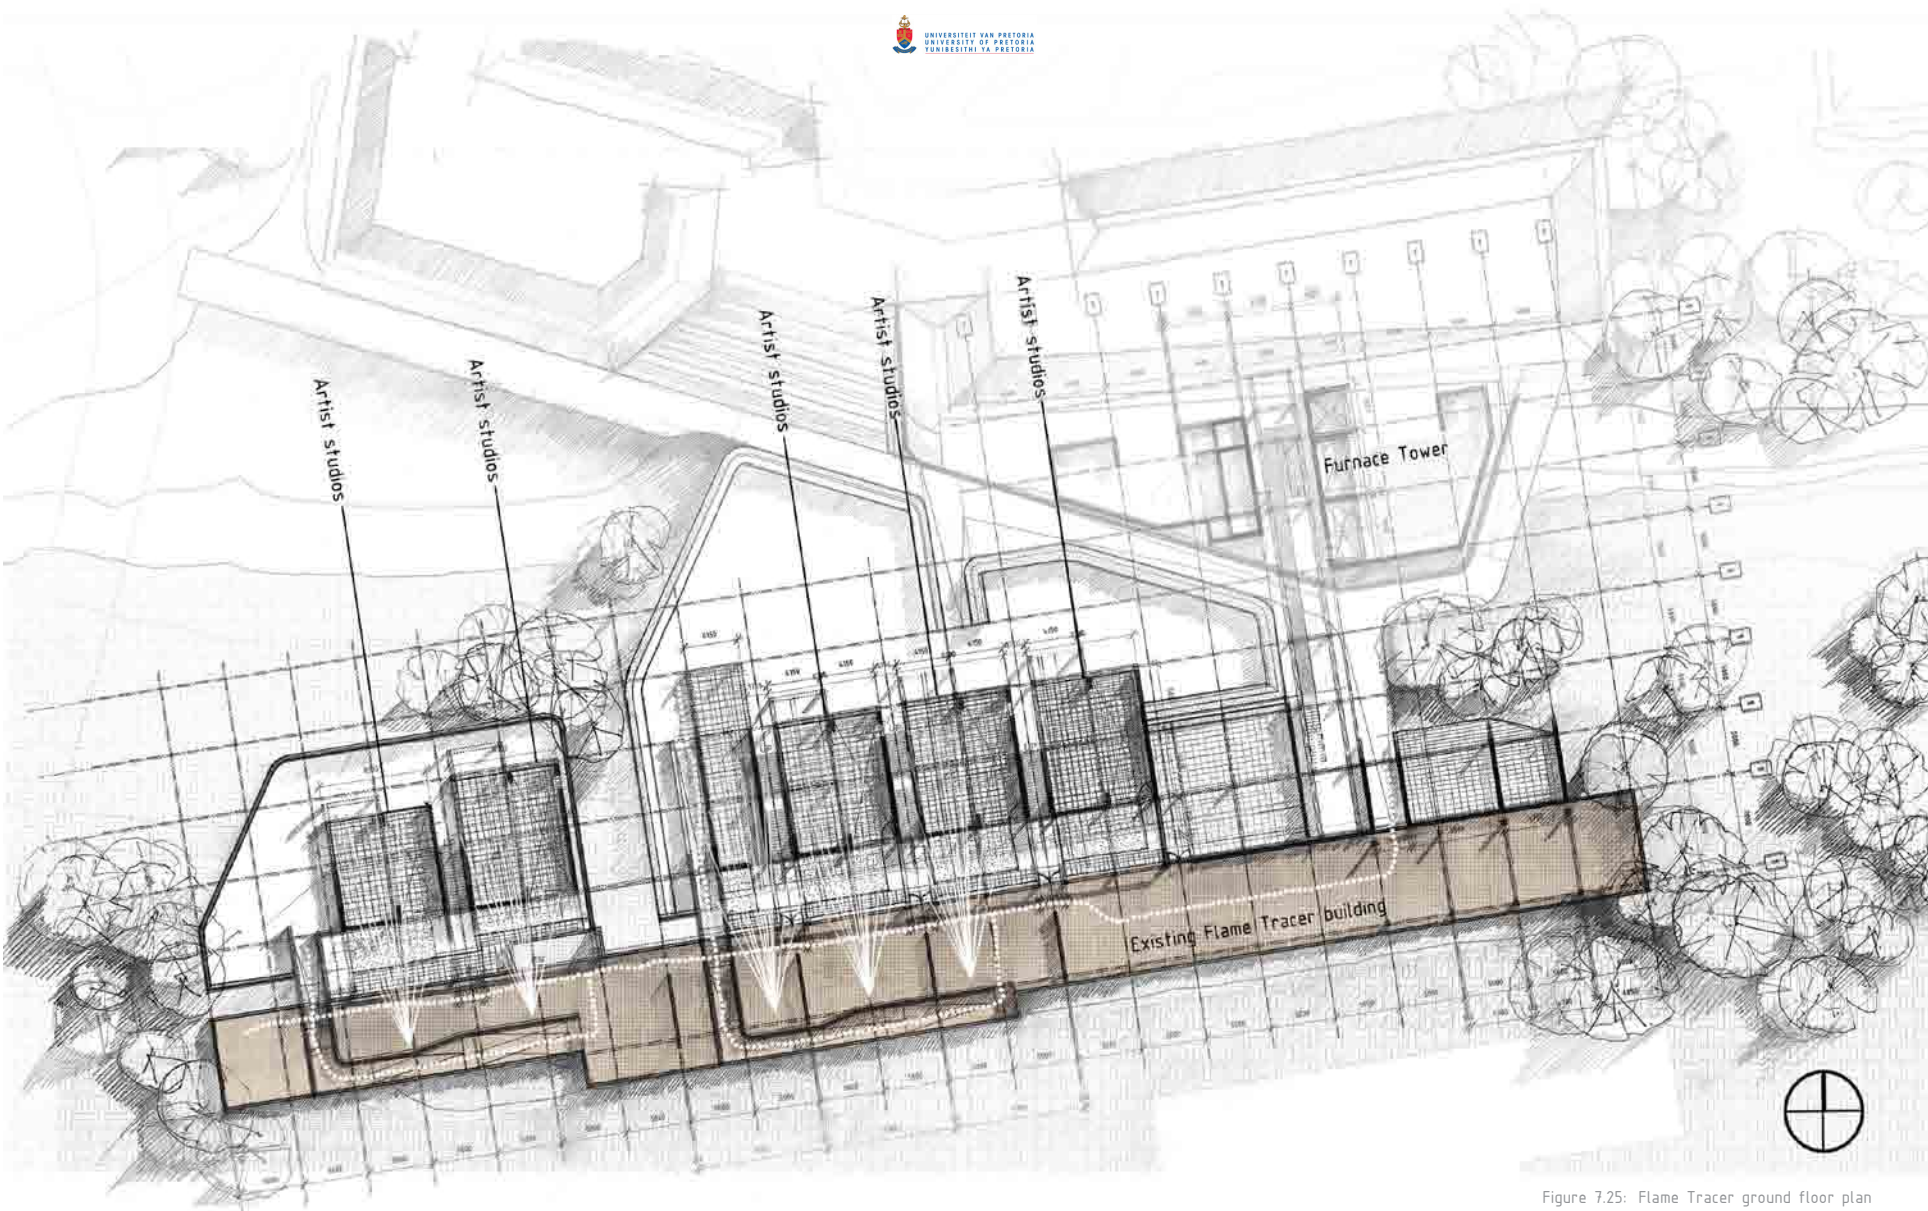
Flame Tracer ground floor plan showing artist studio additions, nts (Author, 2011).
